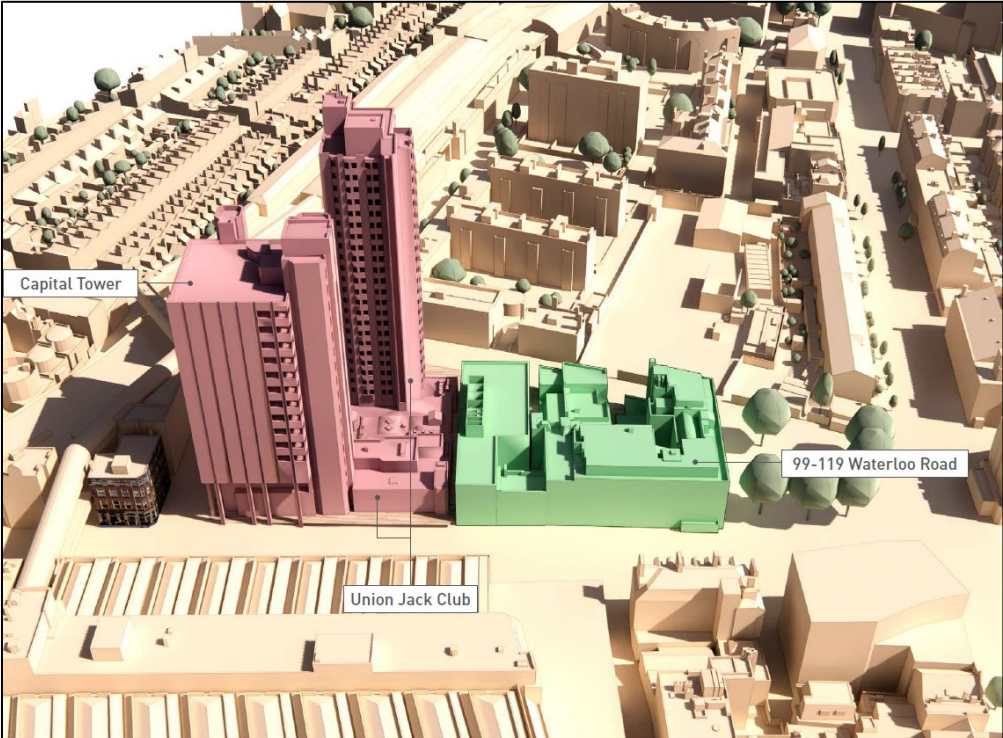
Existing buildings with the proposed Waterloo Central Office development outlined, as viewed from Waterloo Road.
